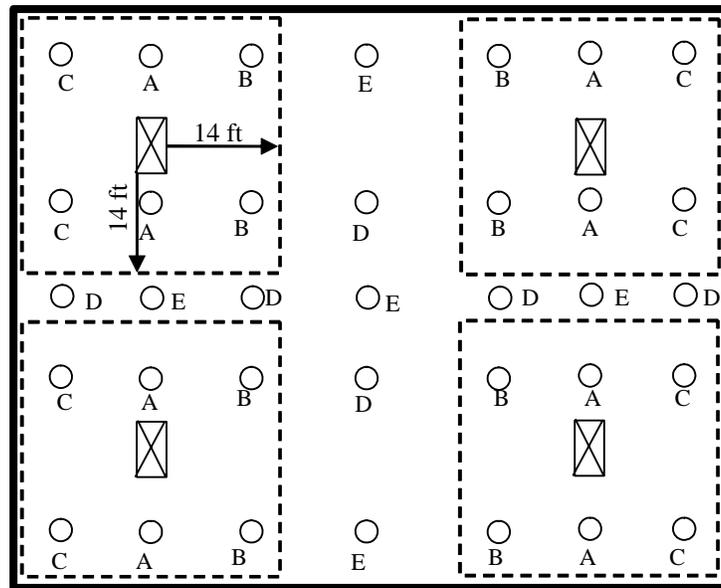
Lighting Plan Showing Daylit Areas and Circuits (20 ft ceiling height)
